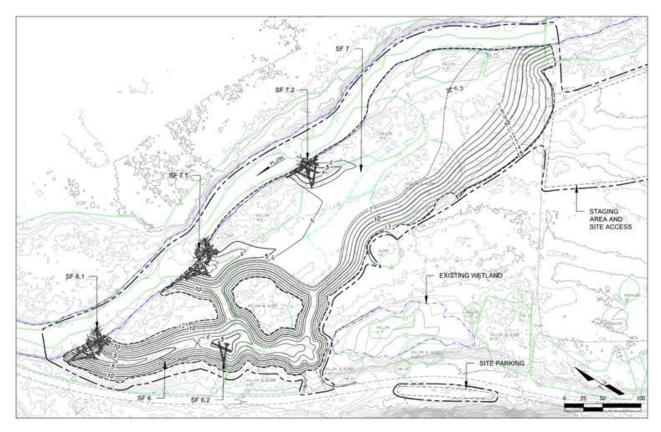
Site plan for SF 6 and SF 7 showing grading, large wood structures, and site access.
